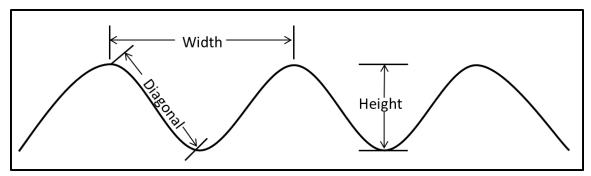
Measurements of culvert corrugations relevant to lamprey attachment.
